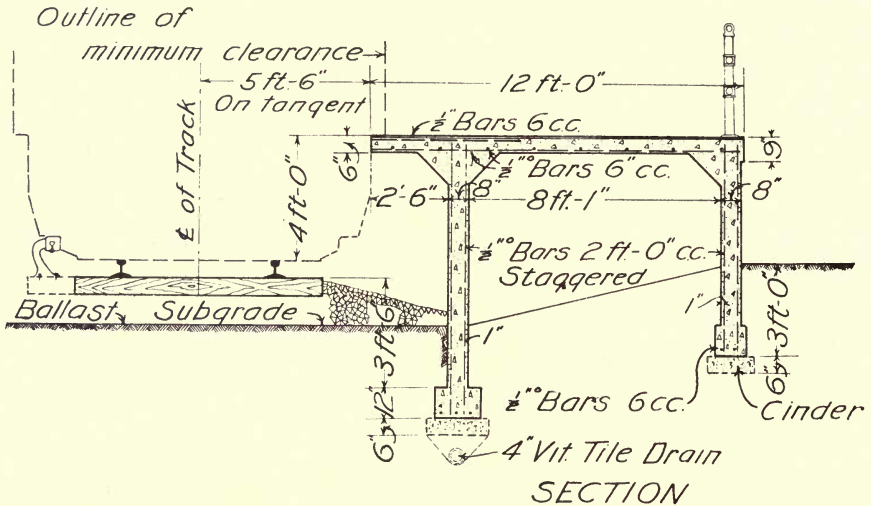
CROSS SECTION OF STANDARD OUTSIDE PLATFORM, N. Y. C. & H. R. R. R.
